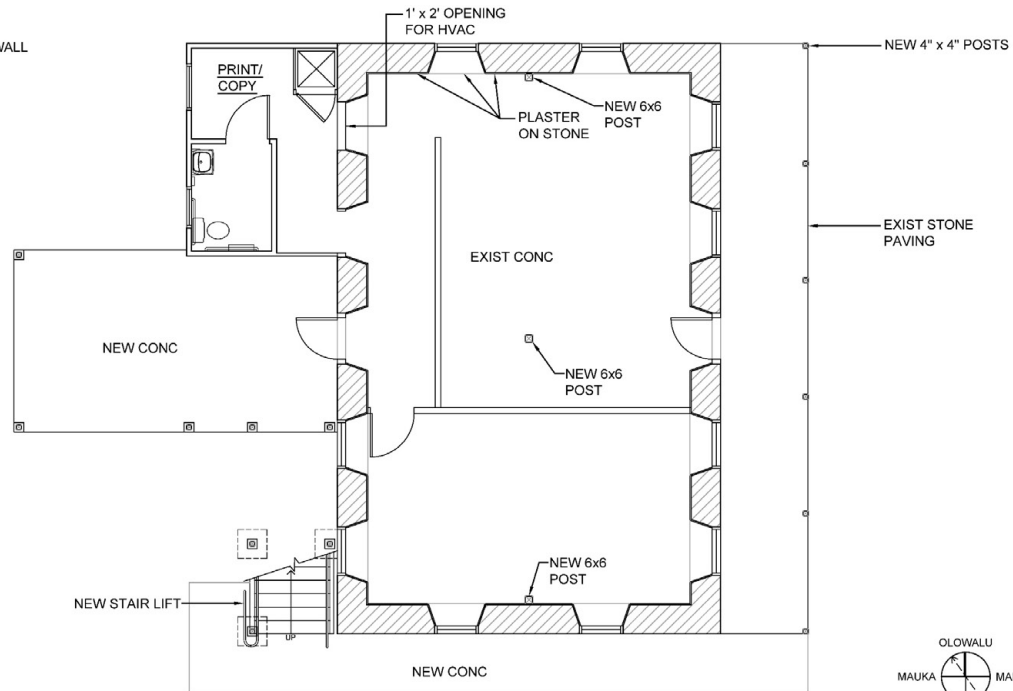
Seamen's Hospital and Plantation House Site Plan.
